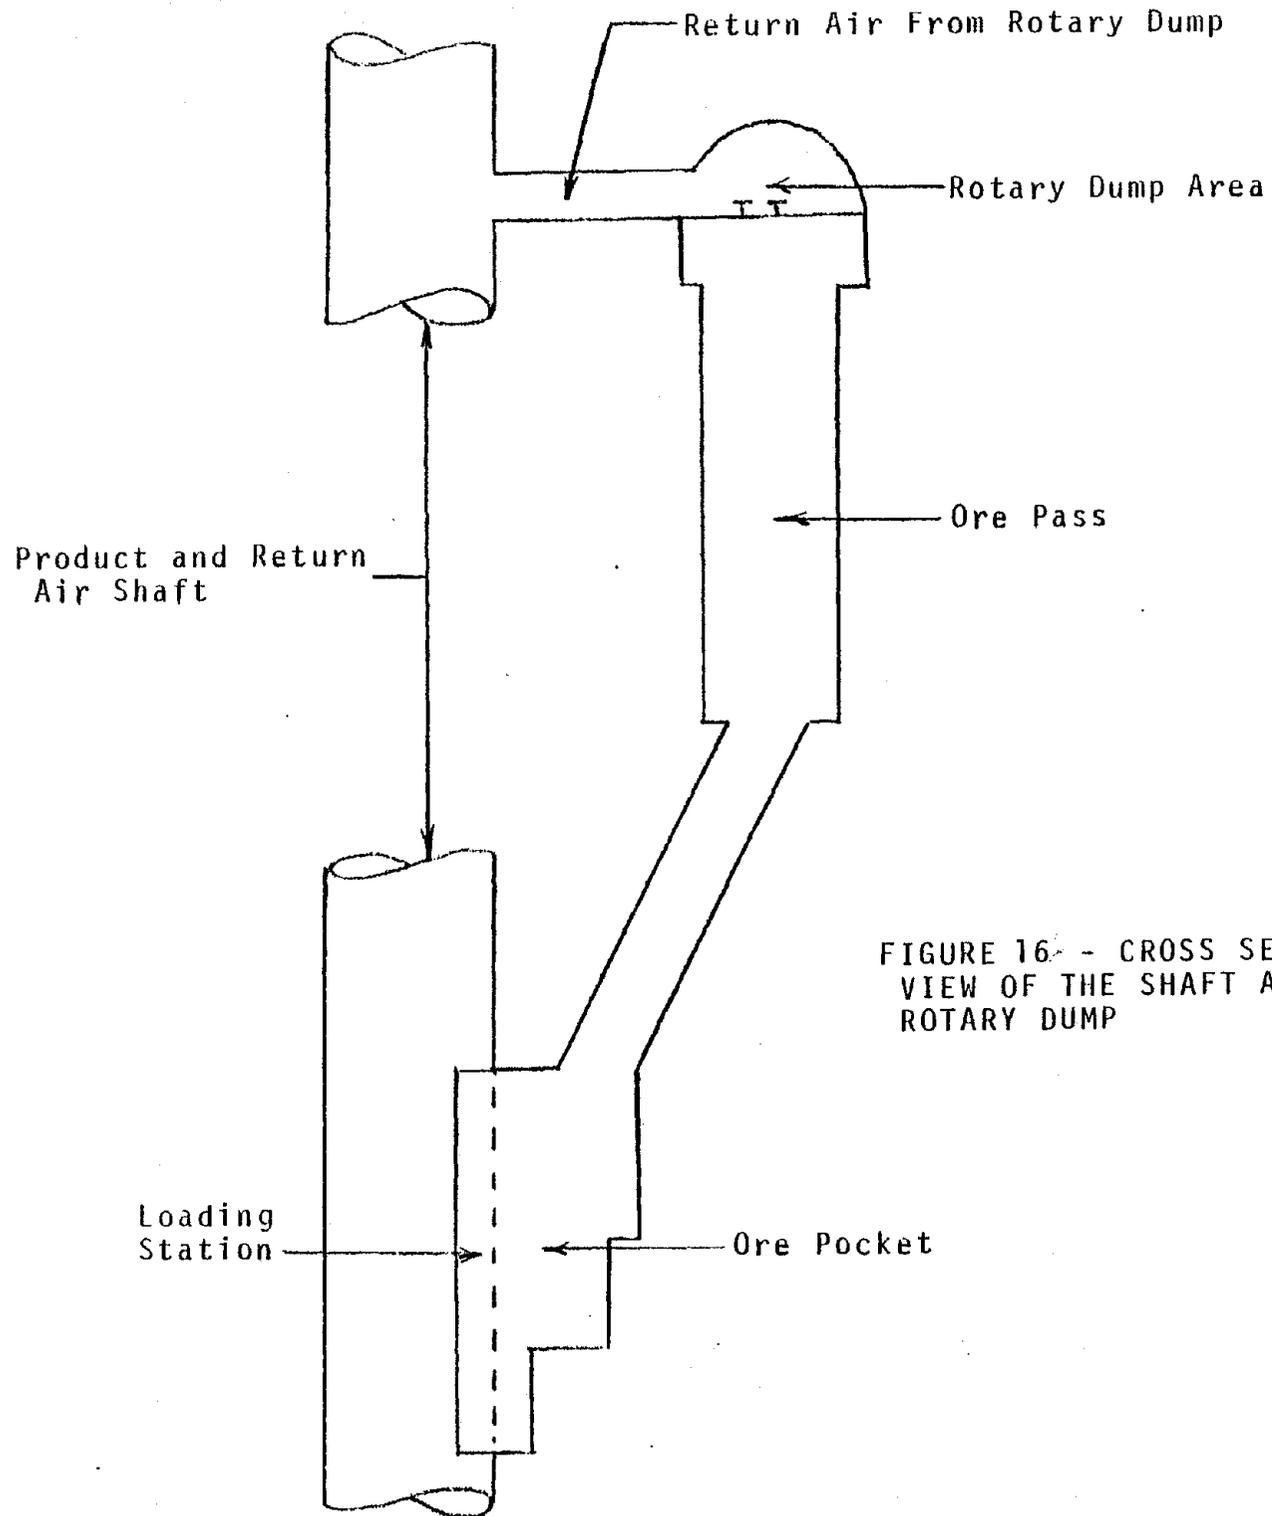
CROSS SECTIONAL VIEW OF THE SHAFT AND ROTARY DUMP
